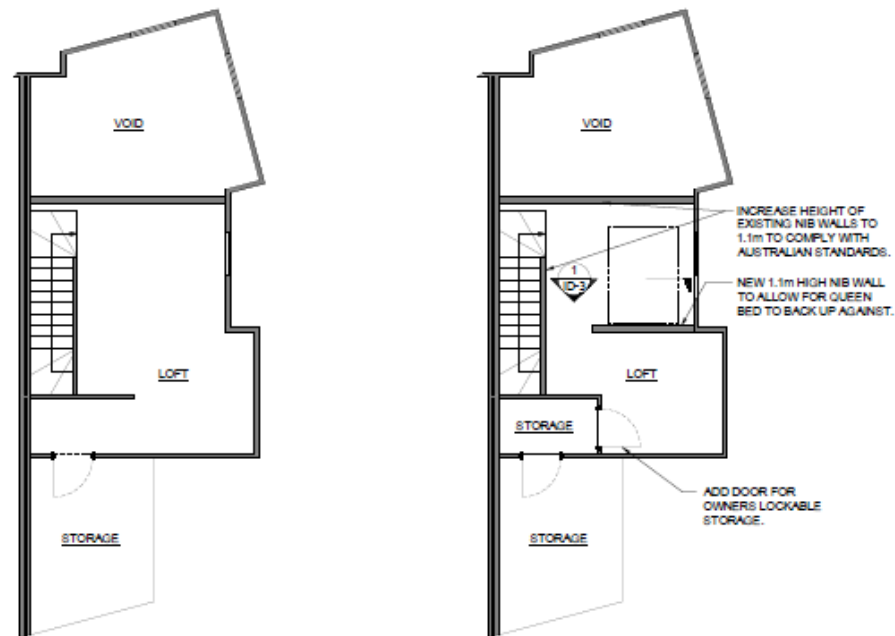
| Existing (left) and proposed (right) loft floor level (Source: Applicant's documentation)
